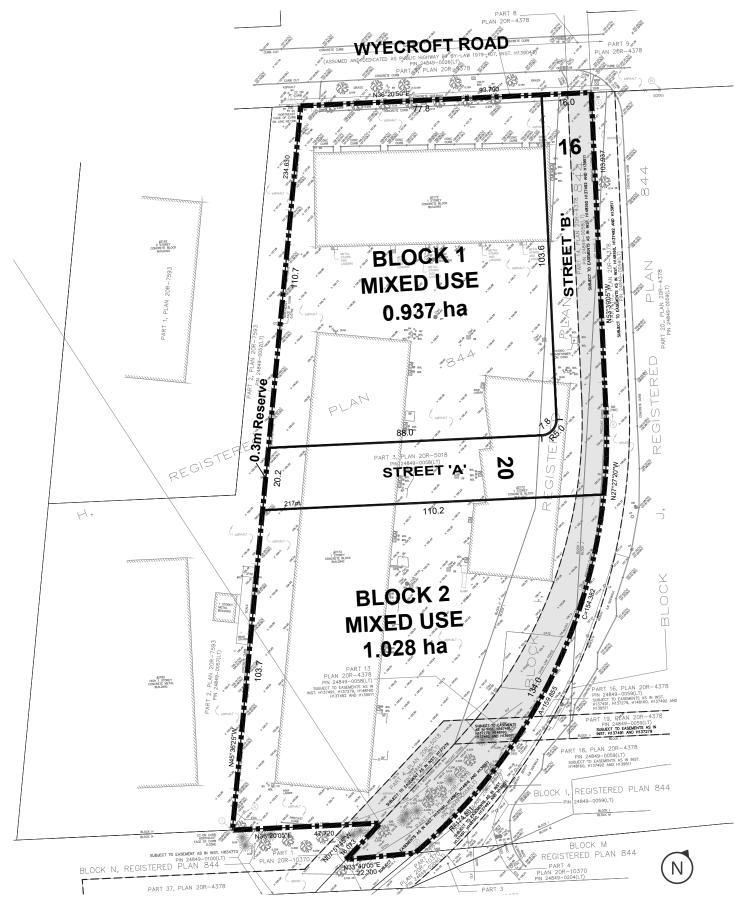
Draft Plan of Subdivision (Prepared by Bousfields Inc., August 2025)
